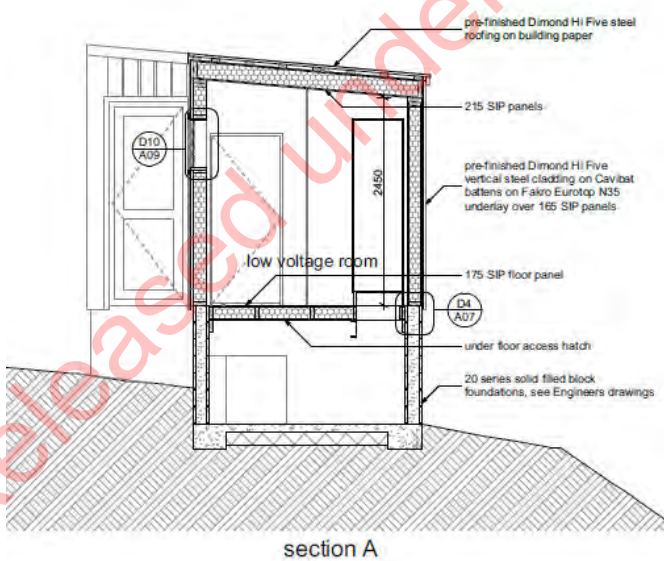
Plans of hut foundations for both operators' huts. Refer attachment "Excavation Plan - Tūroa Building Upgrades"
